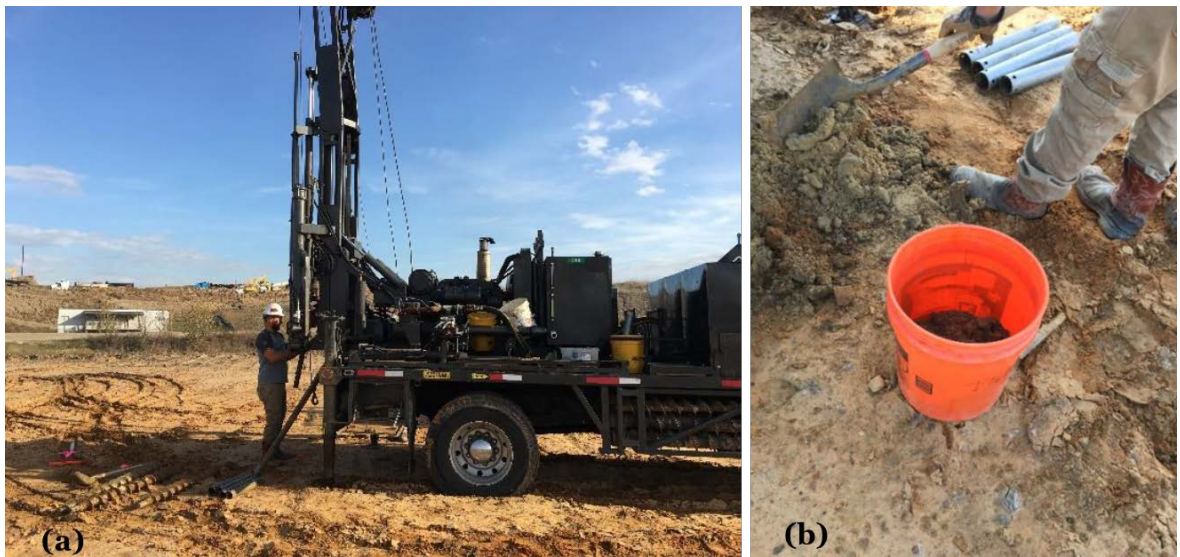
1 (a) Drilling Rig set up; (b) Collection of remolded sample.
